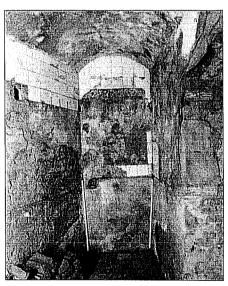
North wall of Dairy (B35) original masonry near right (Photo 58)
